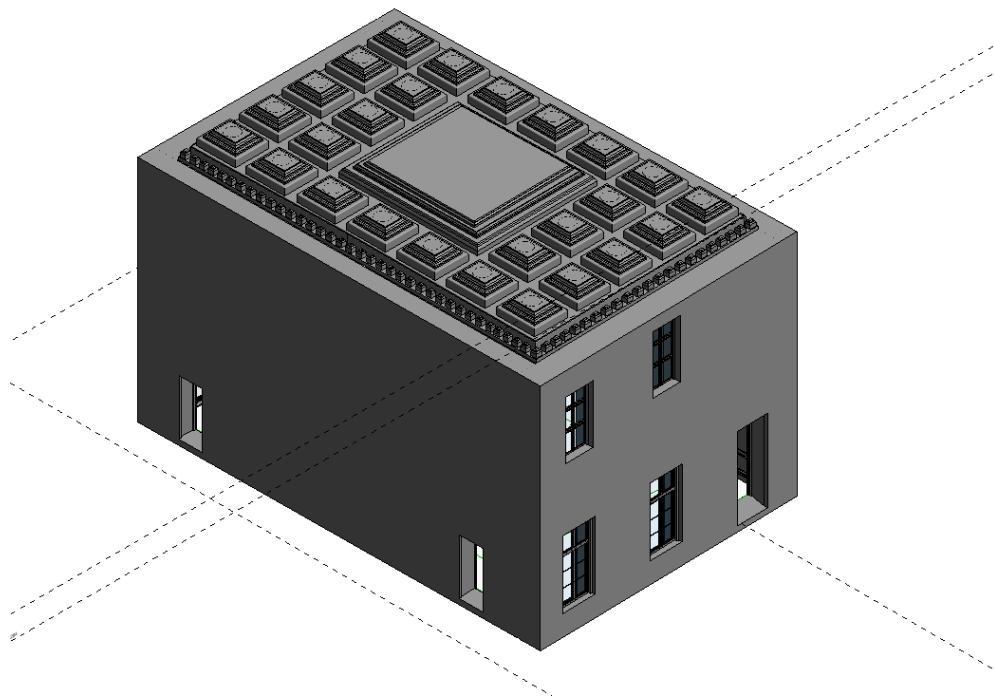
Svizzeri's room ceiling. HBIM model of the Svizzeri Room ceiling using Revit adaptive masses.
